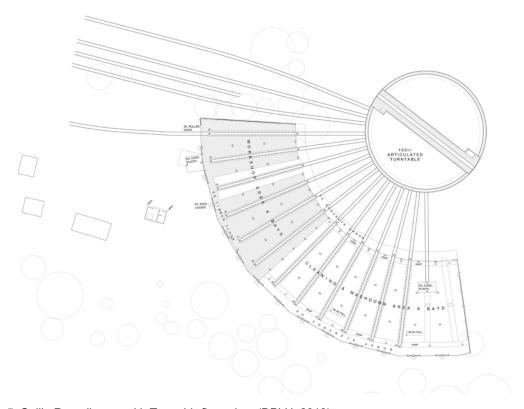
Collie Roundhouse with Turntable floor plan. (DPLH, 2018)
